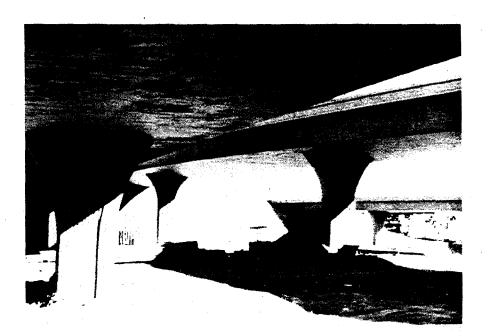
Box Girder Bridge Constructed Using At-Grade Forming
